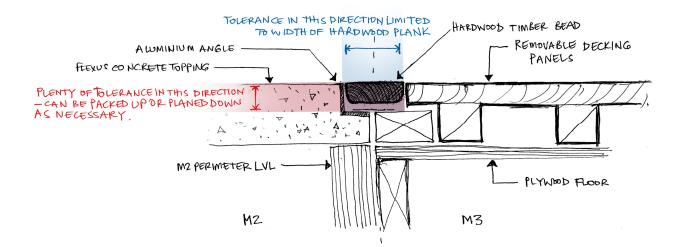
Sectional detail sketch showing tolerance limits for the harwood timber inter-module beads
